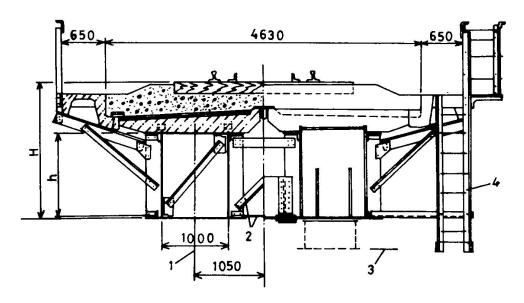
Typical cross section of superstructure comprising two shop fabricated units.
